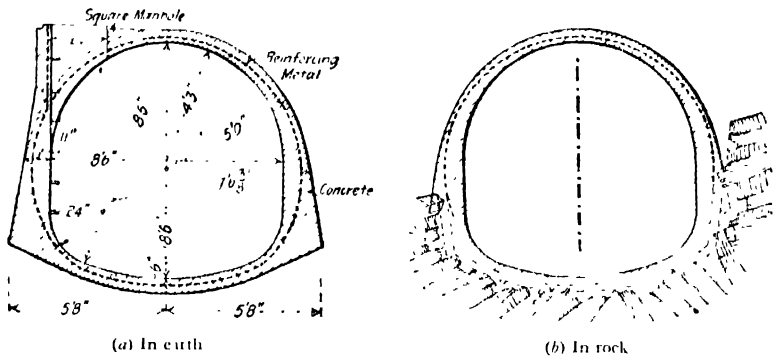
Typical Reinforced Concrete Pipe Sections
